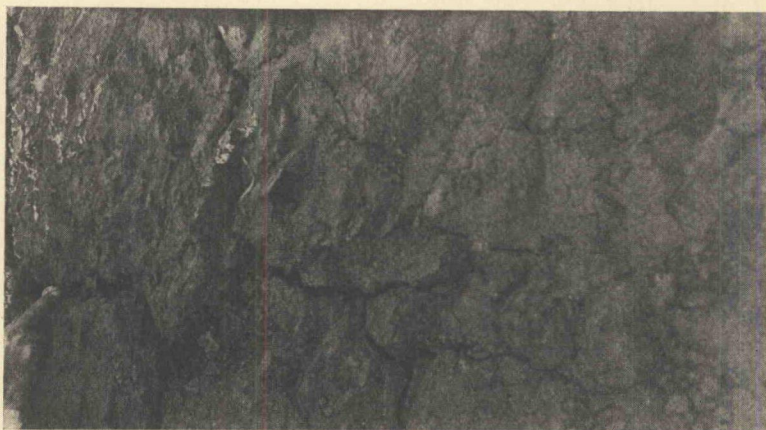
La Tijera Boulevard, Los Angeles (1934). Shrinkage cracks in yellow clay subsoil utilized in stabilization construction
